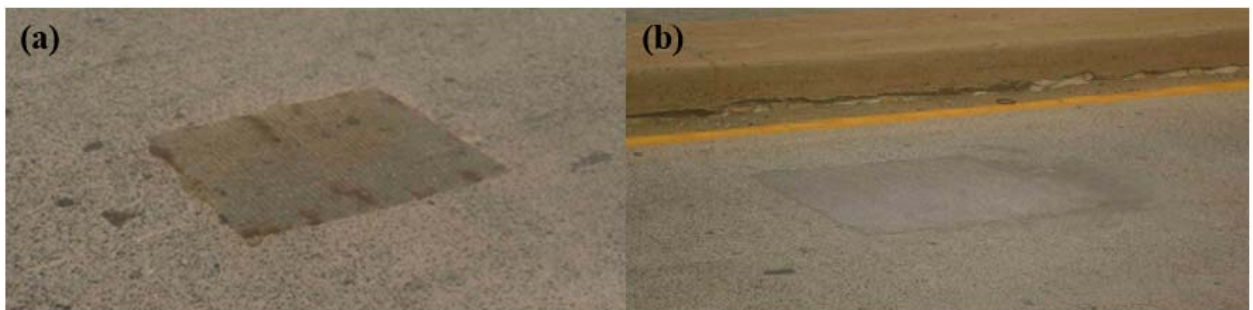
Example of (a) old bituminous patch on the concrete deck and (b) new concrete deck patch.
